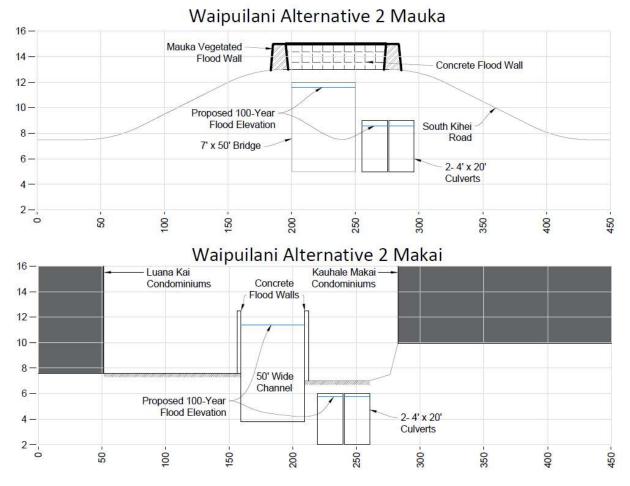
Waipuilani Channel Crossing at South Kihei Road, Proposed Alternative Option 2
